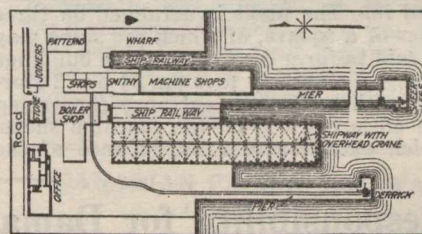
Wallace Shipyards, Ltd., plant, North Vancouver.
